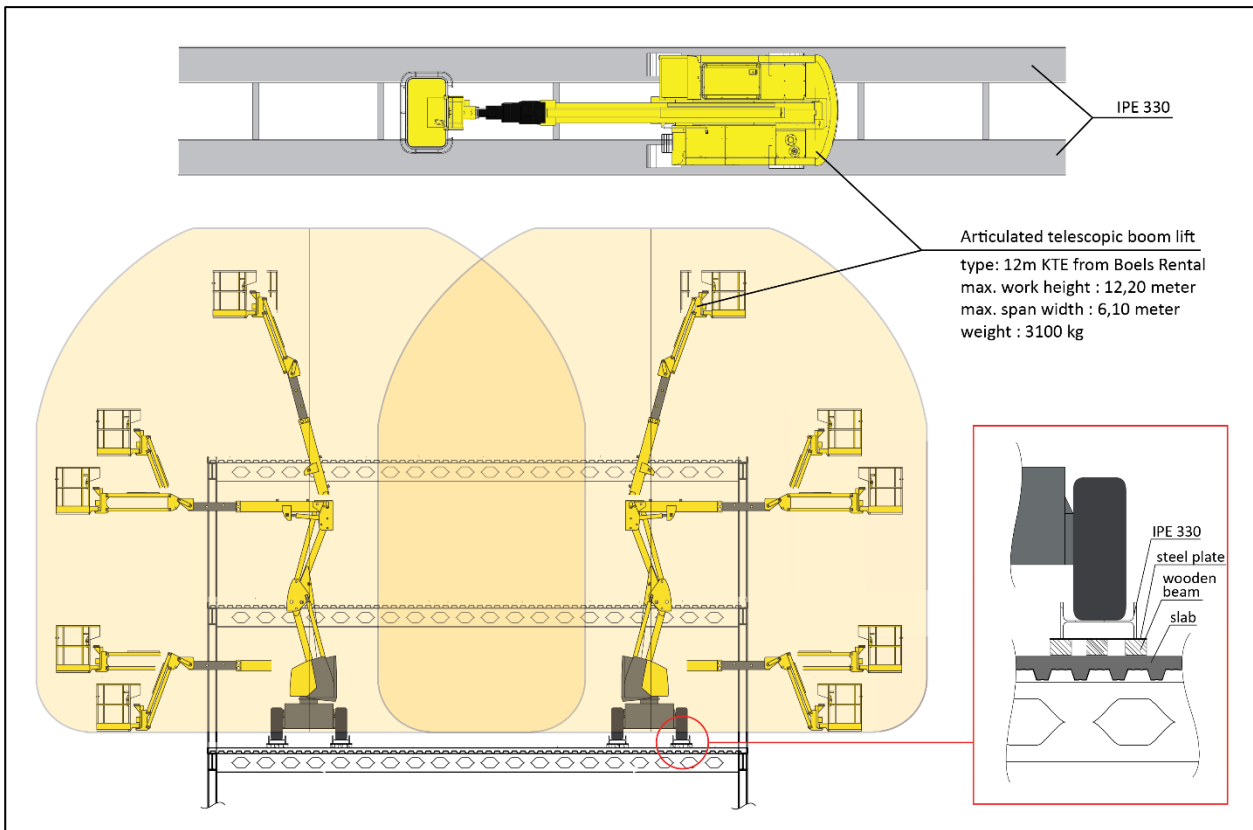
Articulated telescopic boom lift on steel beam track
